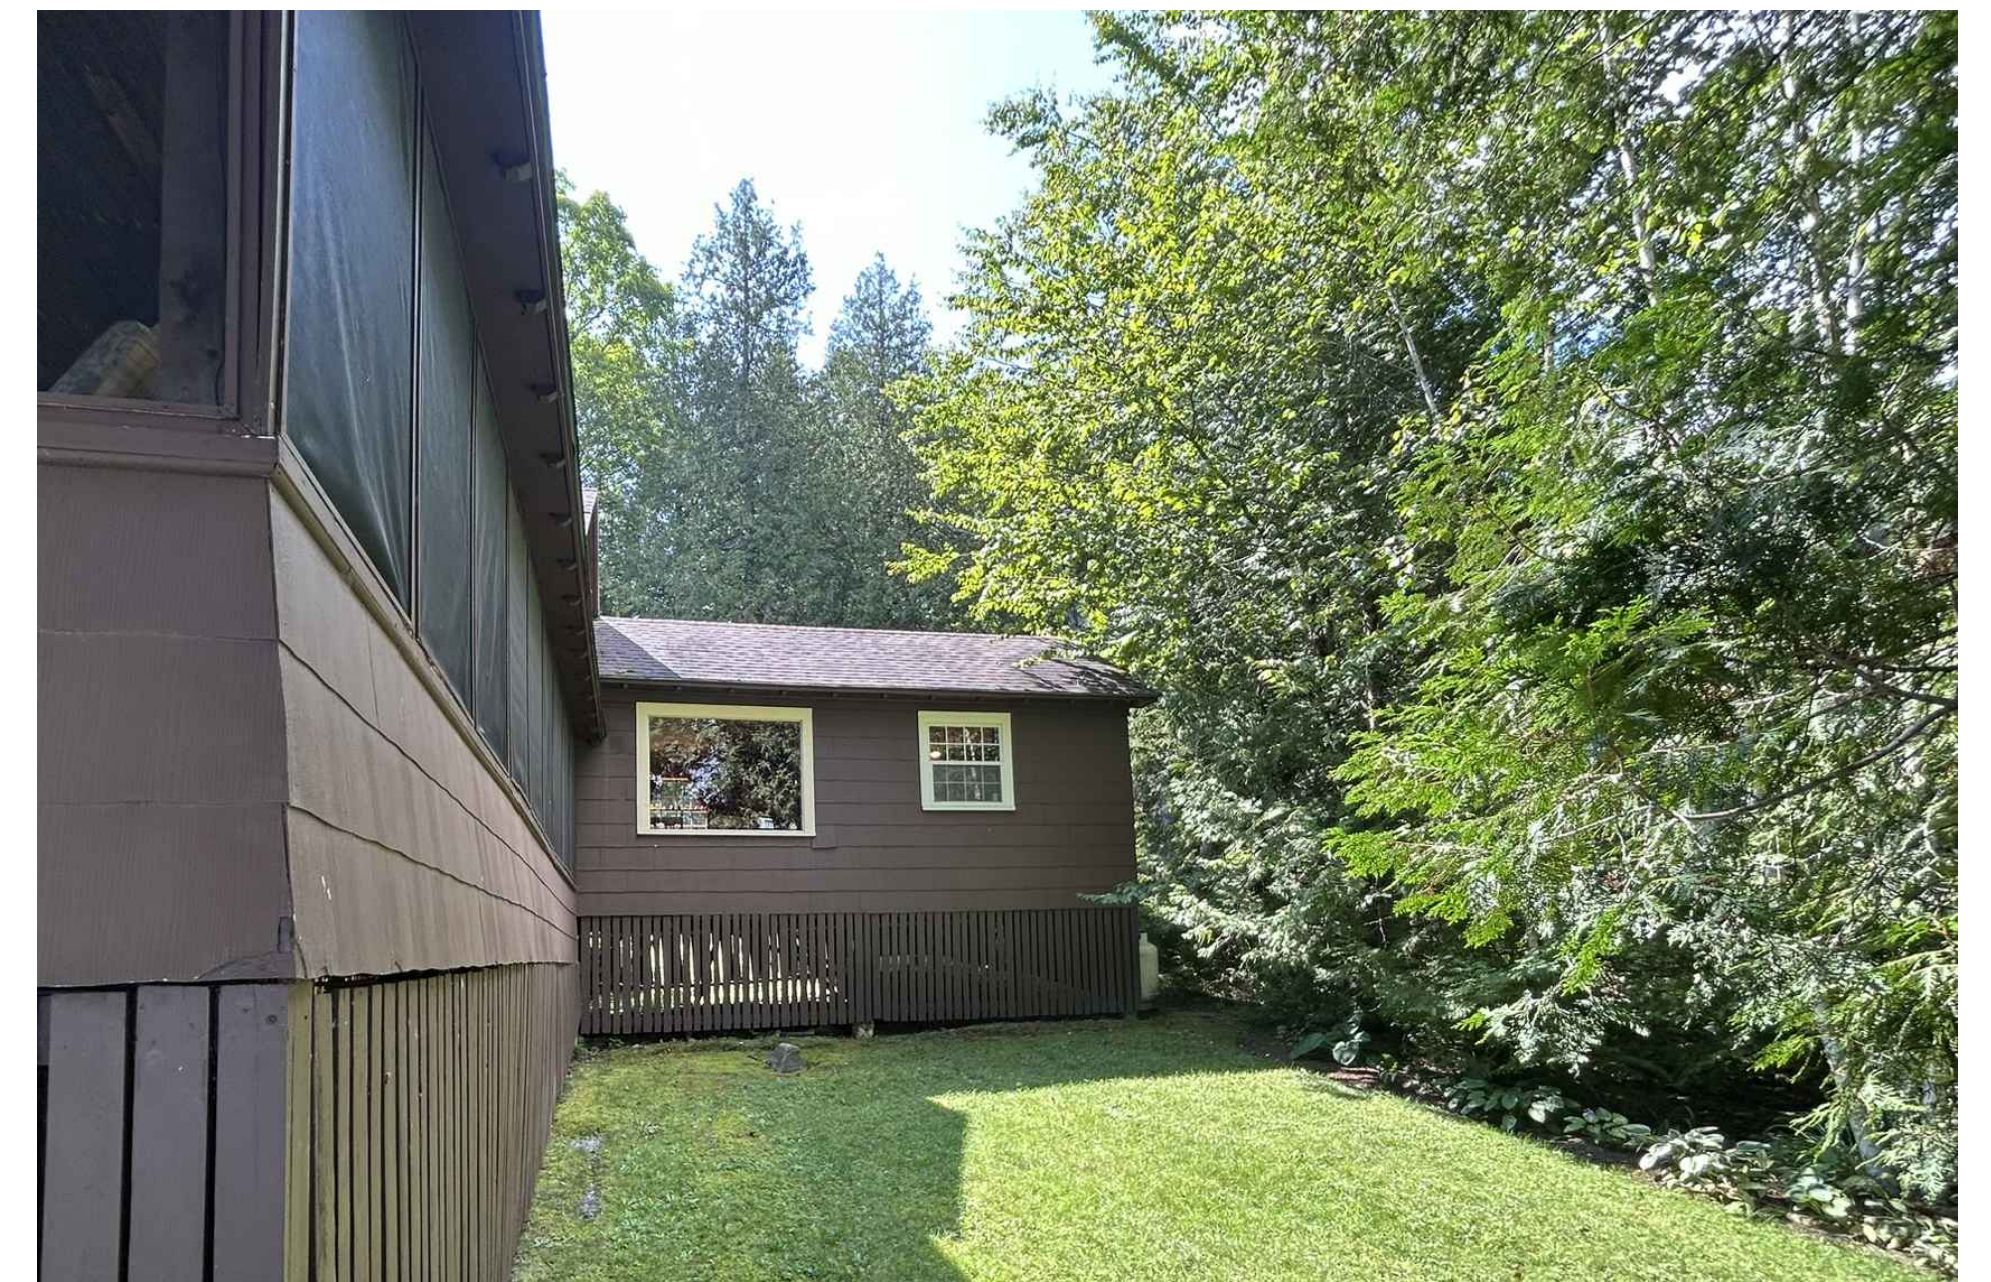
PHOTO OF EXISTING NORTHEAST HOUSE CORNER
